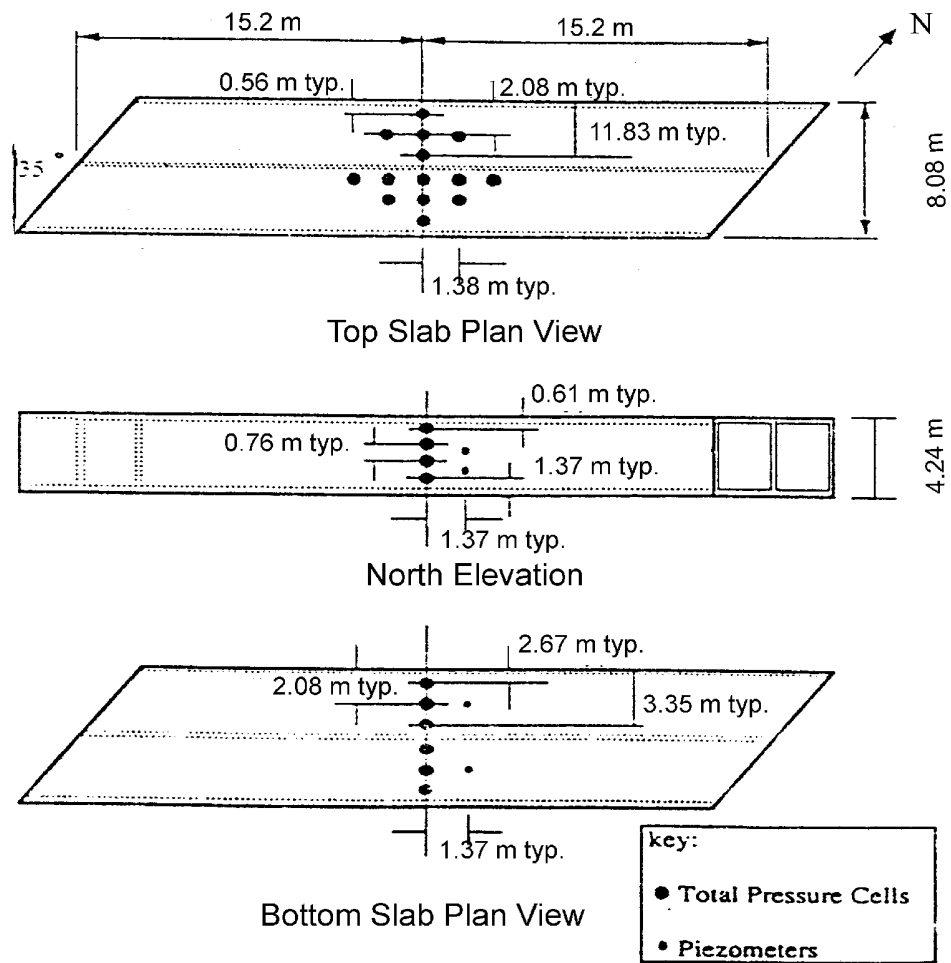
Layout of Earth Pressure Cells in Nebraska Box Culvert Test
